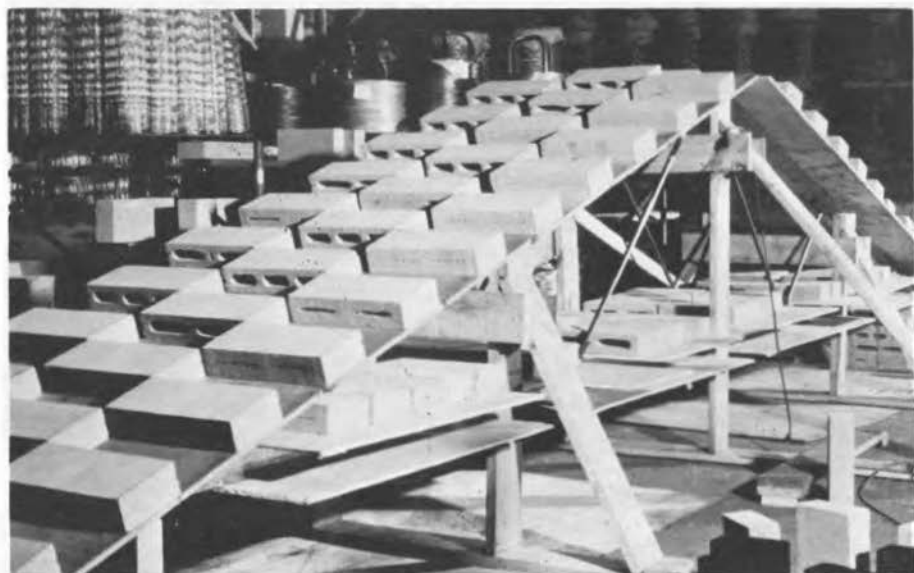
STRUCTURAL TEST ASSEMBLY FOR ROOF
